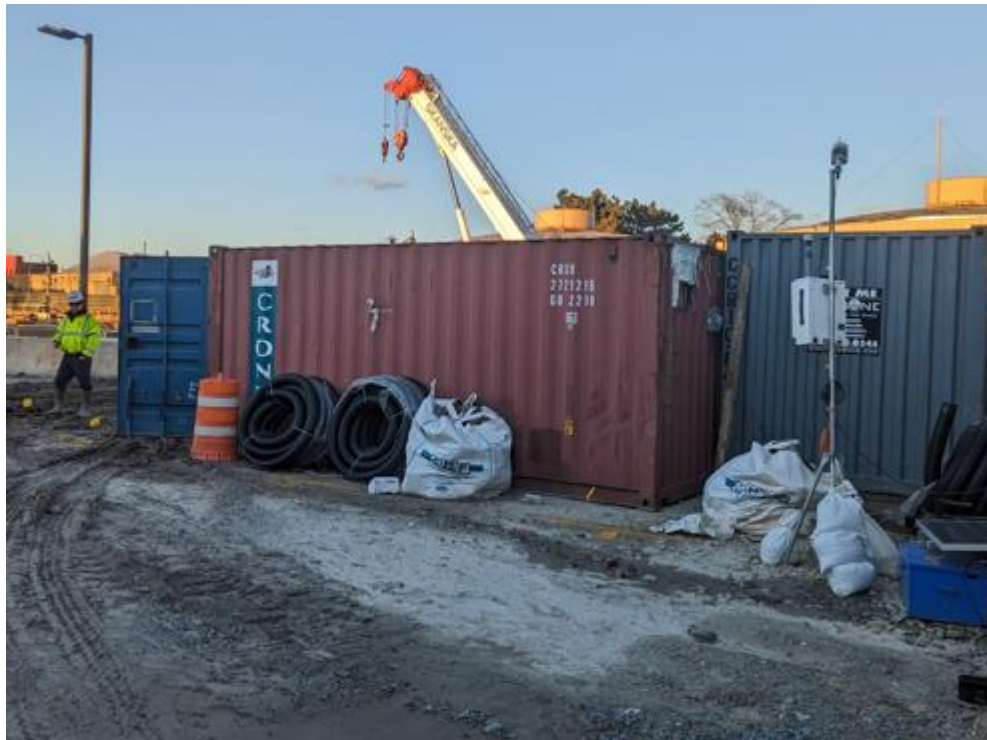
CAMP probe downwind located south of 2.5 acre BUD excavation area
